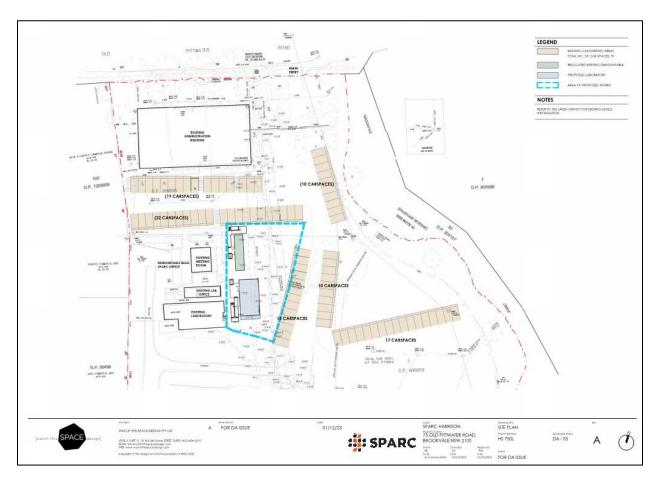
Site Plan (Source: Watch This Space Design Pty Ltd, December 2023)
